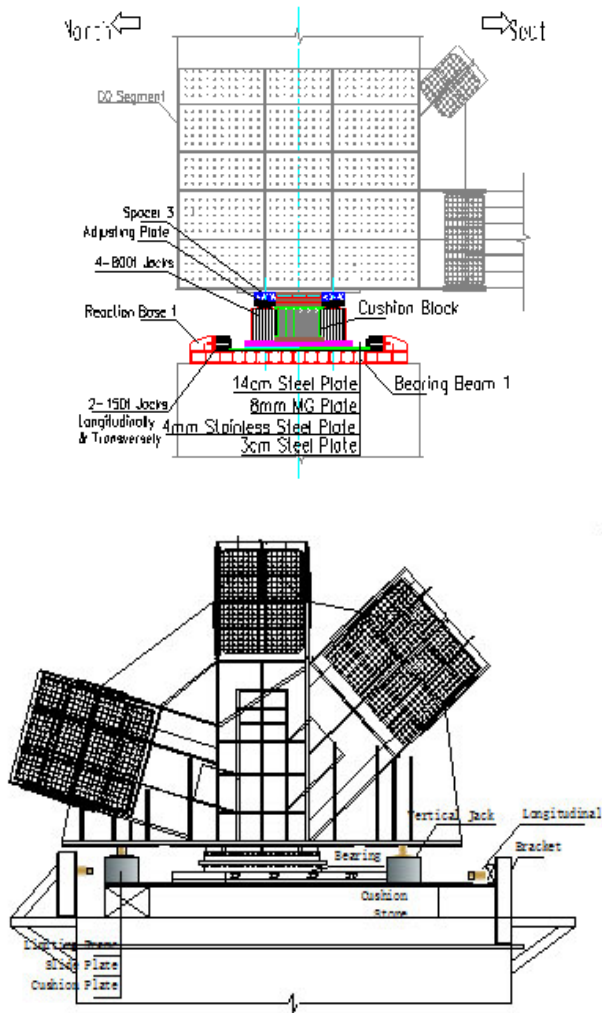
Side Bearing Setting (above) and Middle Bearing Setting (below).
